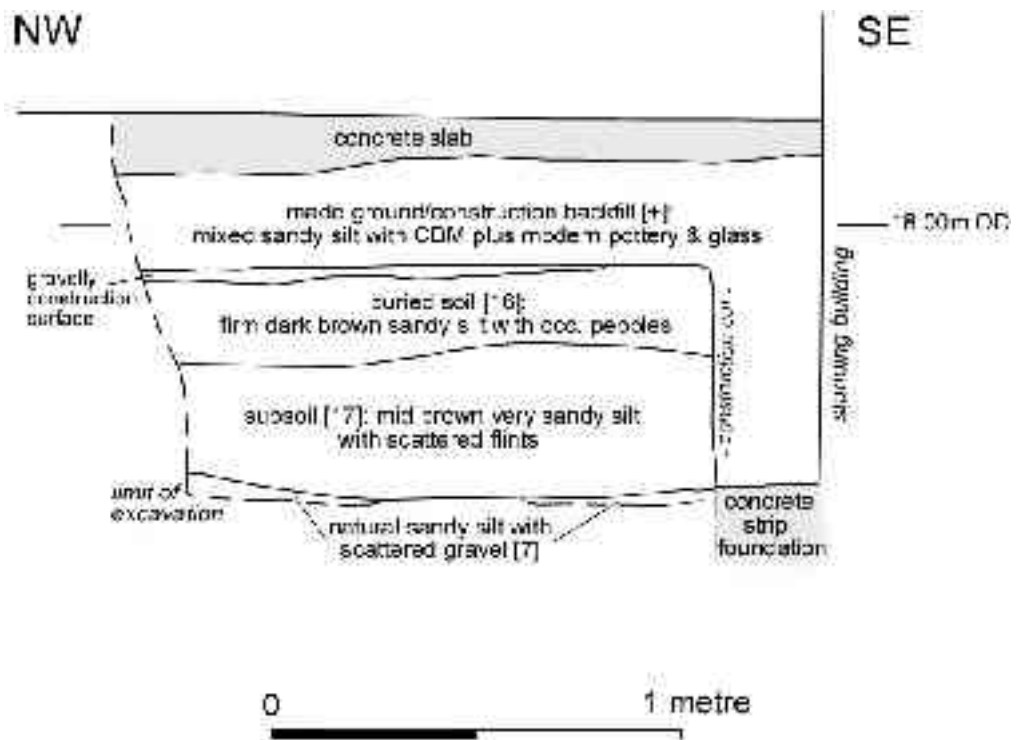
Northeast section of Test Pit 4 after full excavation (located on Figure 38)
